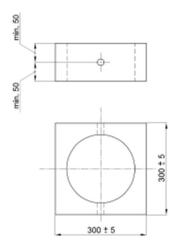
Coupling ring for poles till 630 daN. Dimensions (in mm)
